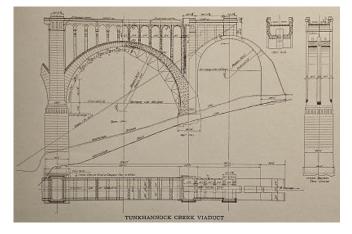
Structural detail of the Tunkhannock Viaduct. Source: ASCE (1914).
